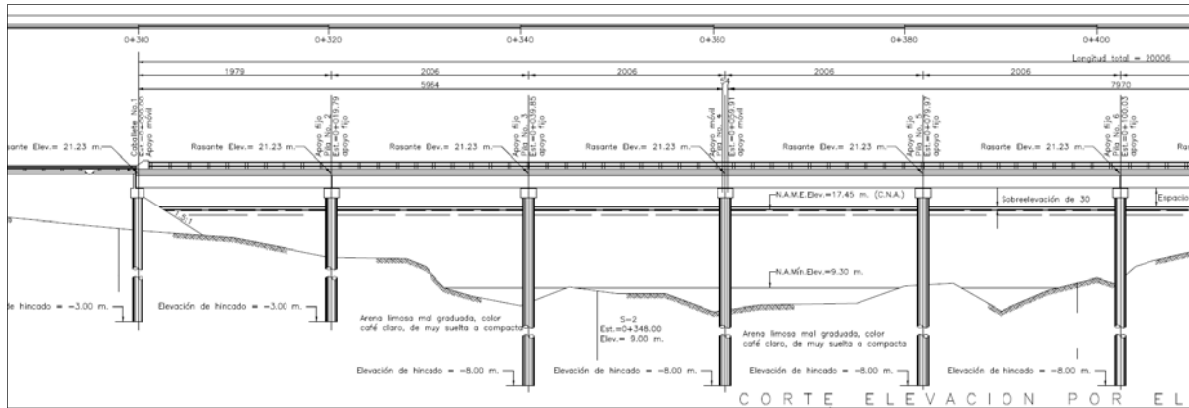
Western half of highway bridge, from original construction plans (SCT 1998).
